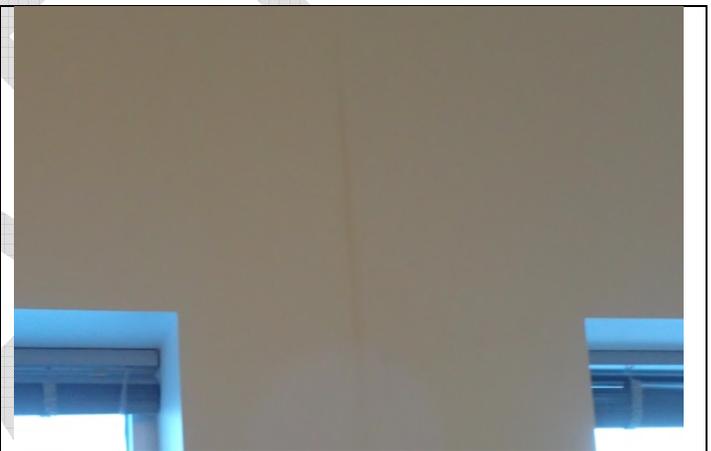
Minor water damage noted between windows in Exercise Room.
